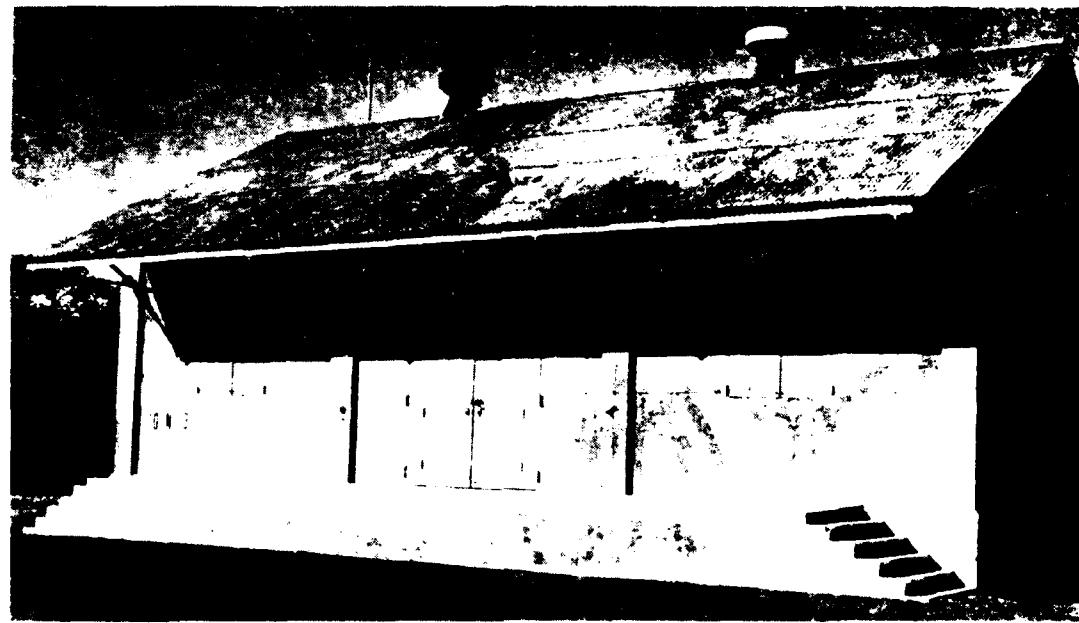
Above-Ground Storehouse -- Concrete Construction With Multiple Cubicles.
